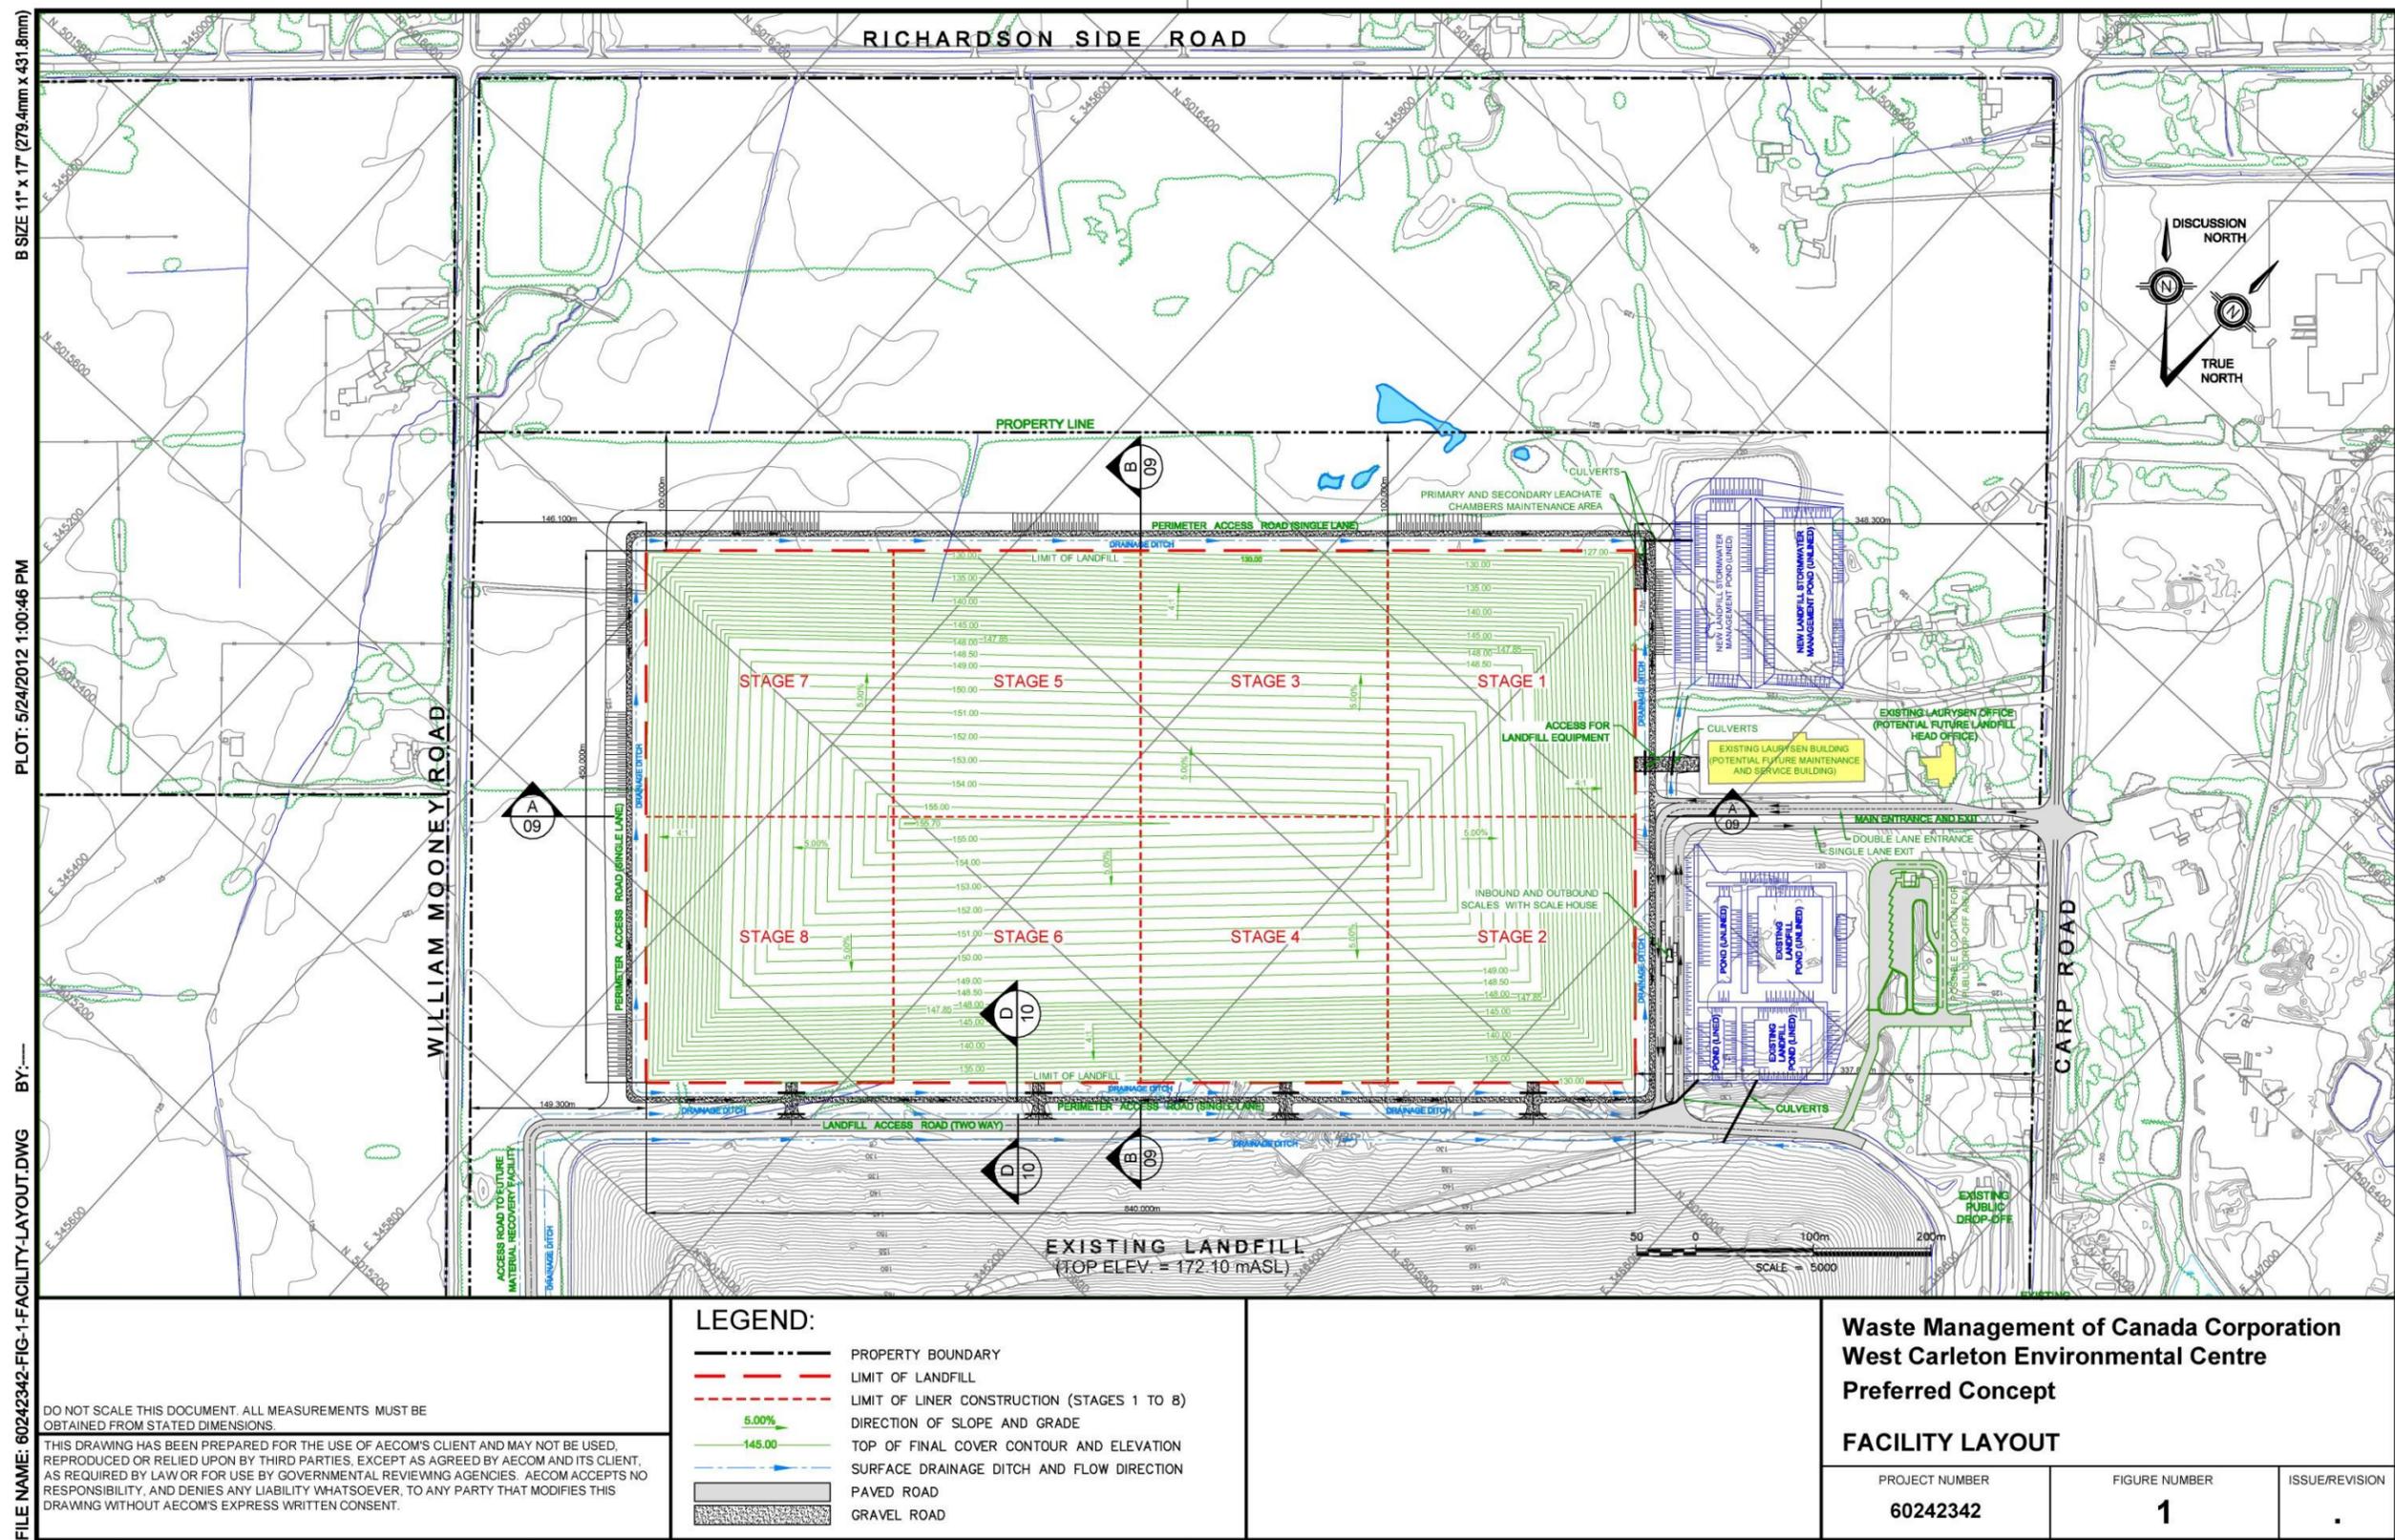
Preferred Alternative Landfill Footprint and Facility Layout
